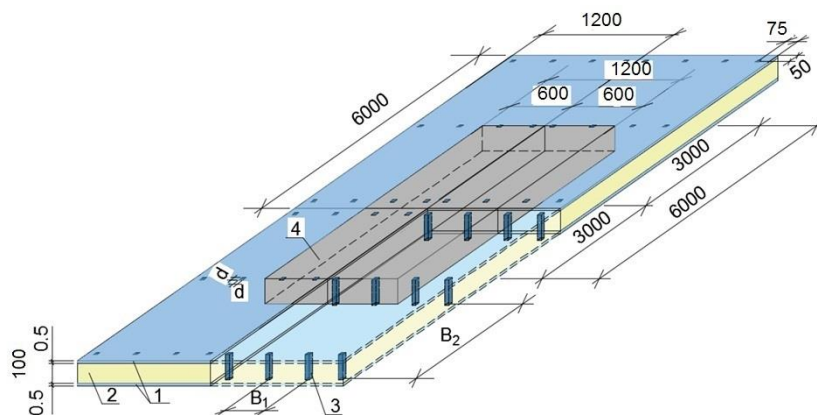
Part of sandwich wall structure: 1 – steel sheets, 2 – core, 3 – threaded screws, 4 – considered part of the wall
